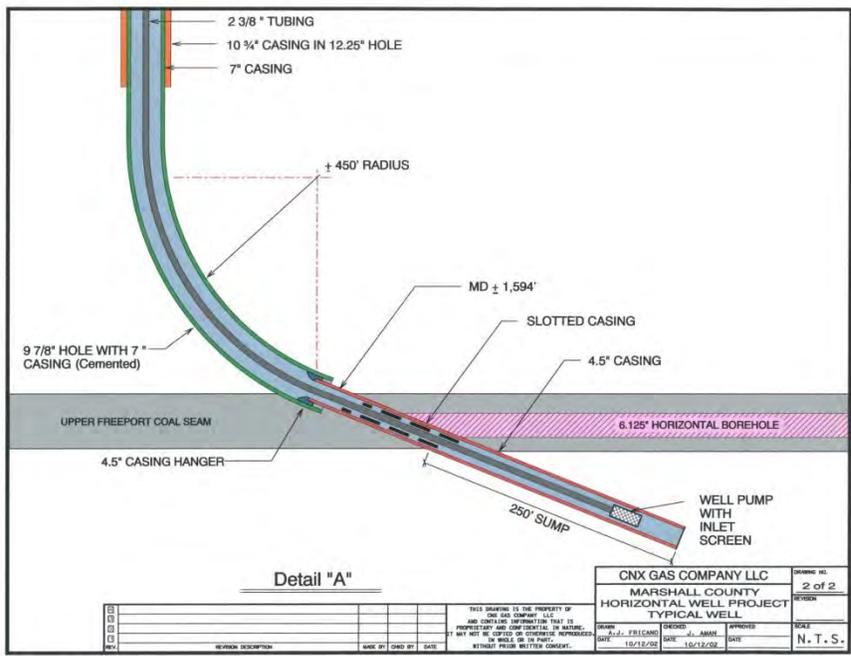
Well detail showing the revision 1 sump and horizontal section plans used at the north site wells.
